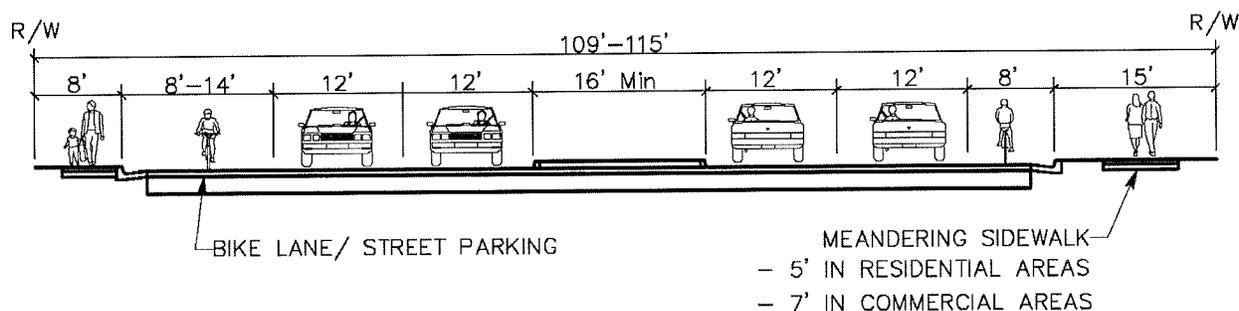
Segment 2 and 3 – Ultimate Roadway Section with Bicycle Lanes (Looking East)
